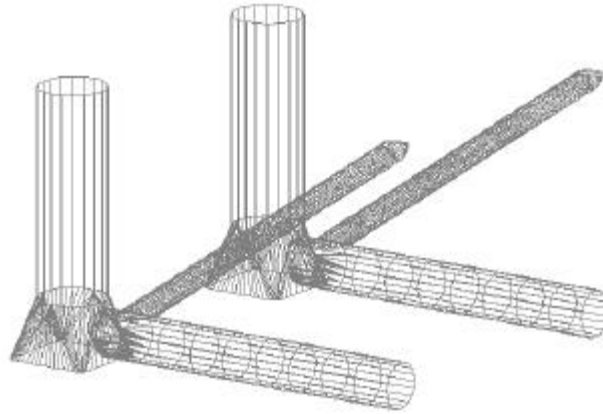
Groups Column & Bracing and Column & Bracing 2 in Para View.
